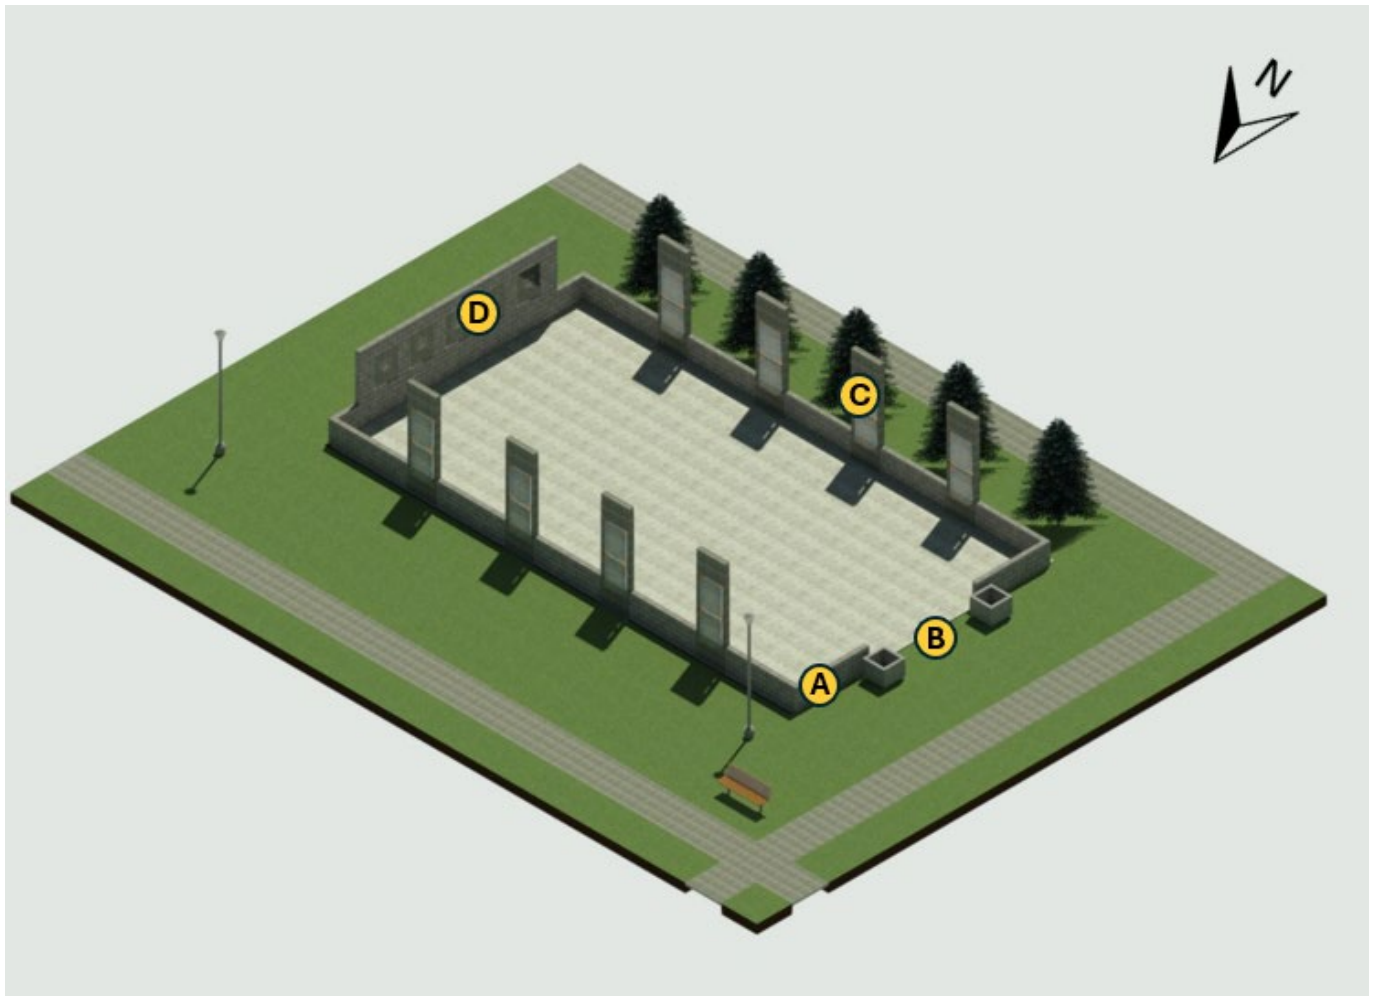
Alternative maintains original layout with a short wall on the east and a tree barrier to the south
